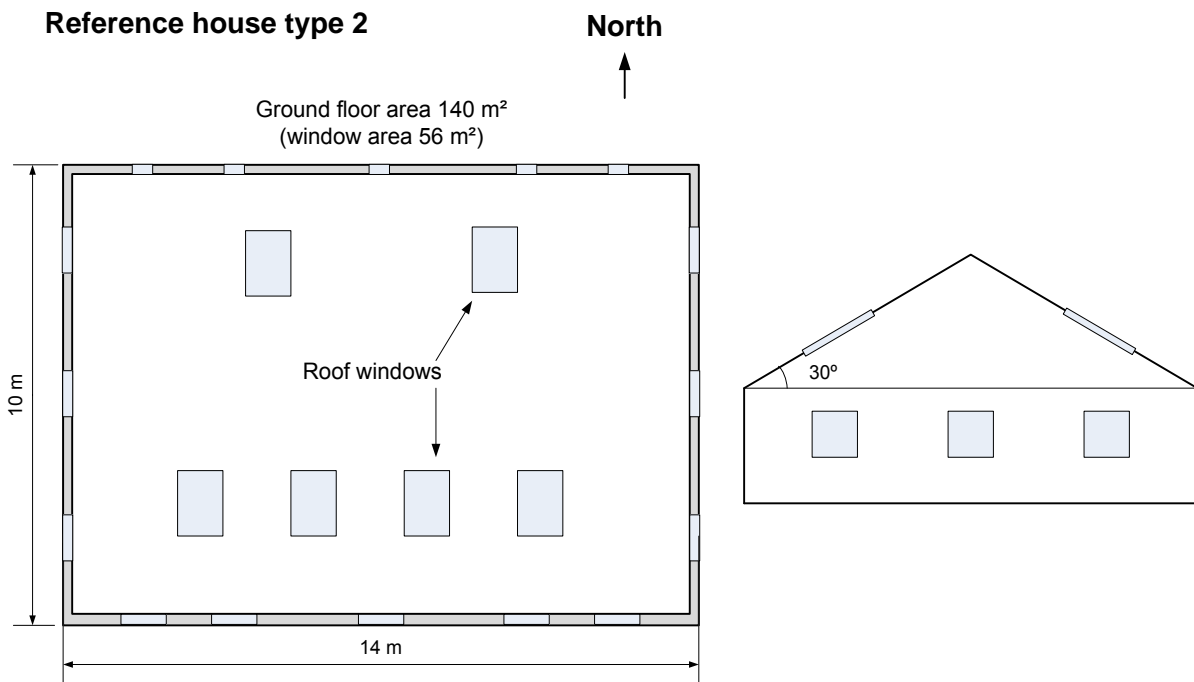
Outline of the reference house type 2 with 30° sloped roof construction
